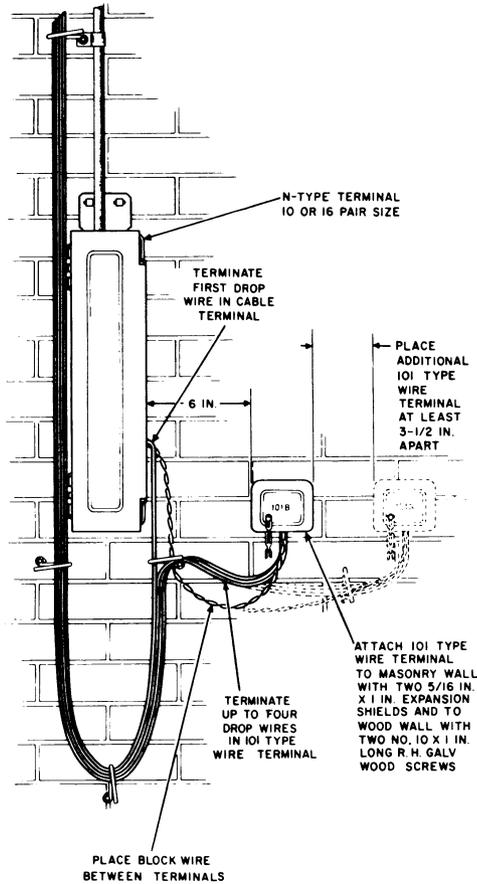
Wiring 101-Type Terminal With Vertical Wall-Mounted Cable Terminal
